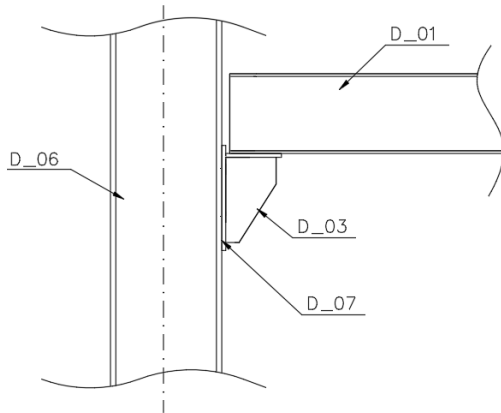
PRINCIPAL DETAIL OF CONNECTION TO EXISTING STEEL STRUCTURE
